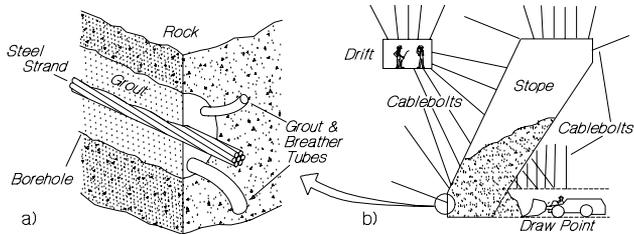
a) Cablebolt element b) Typical cablebolt array
